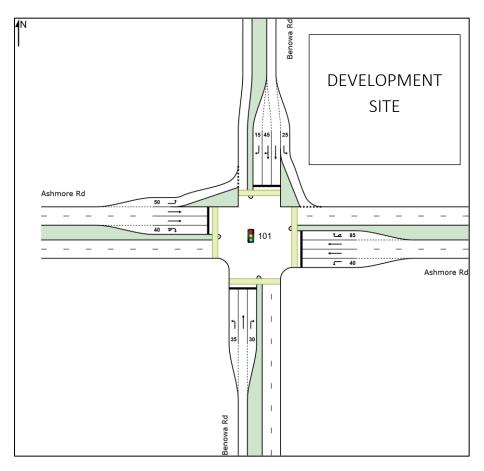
Ashmore Road / Benowa Road Intersection (Existing Configuration) – SIDRA Layout
